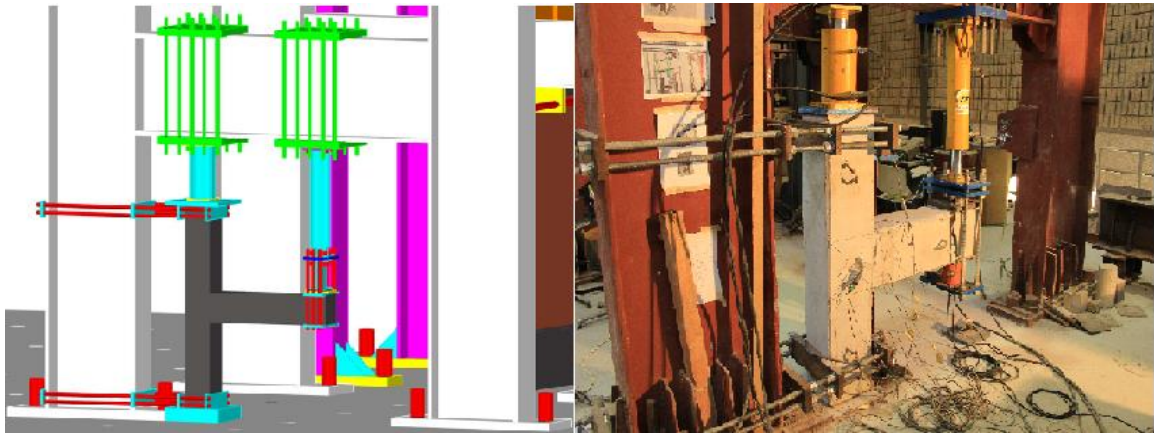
Schematic Diagram for testing setup (left) and testing setup used (right)
